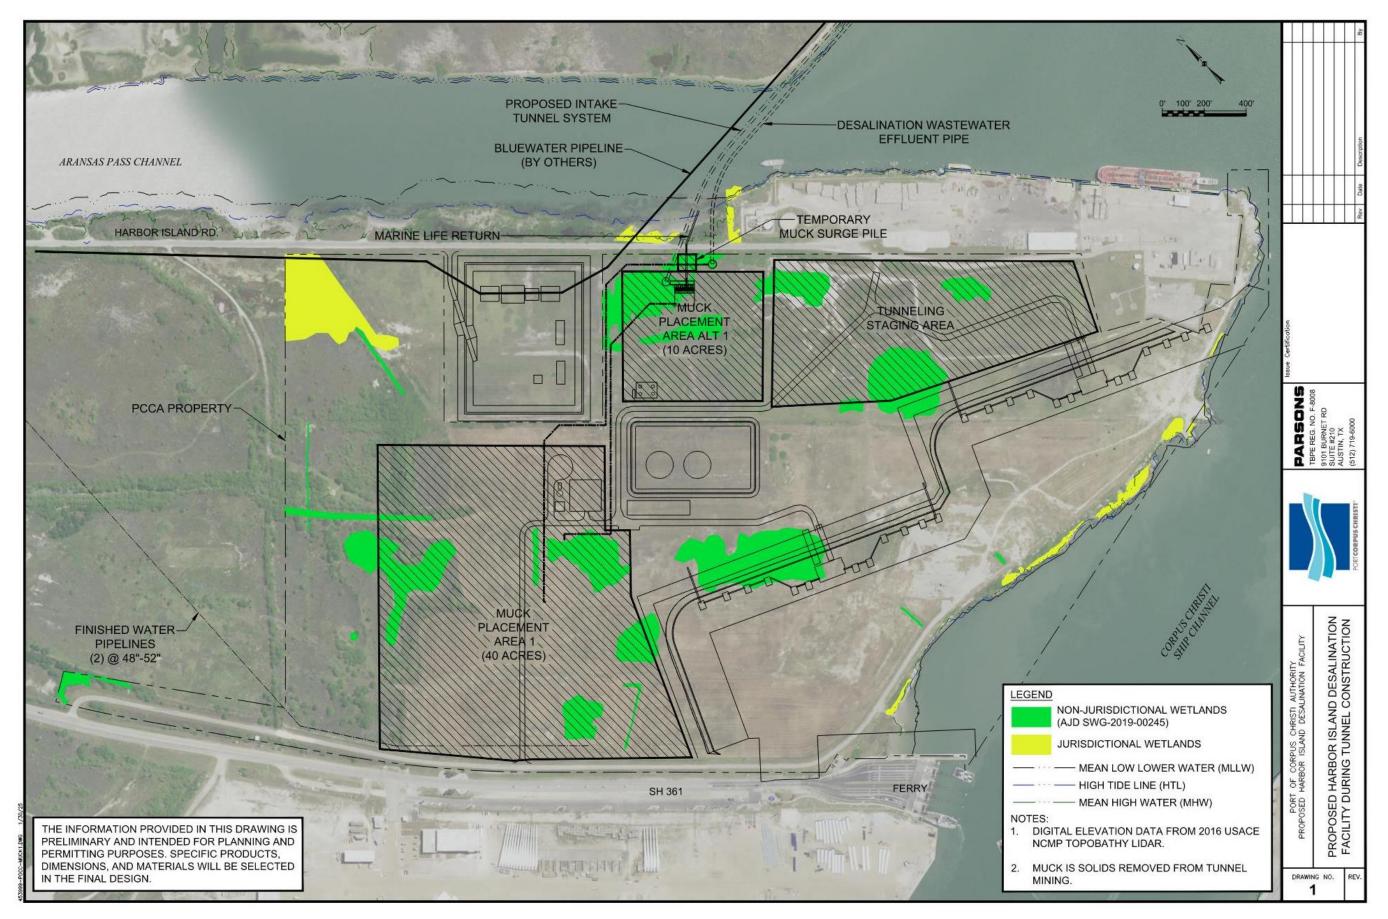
Proposed Muck Fill and Staging Area during Tunnel Construction
